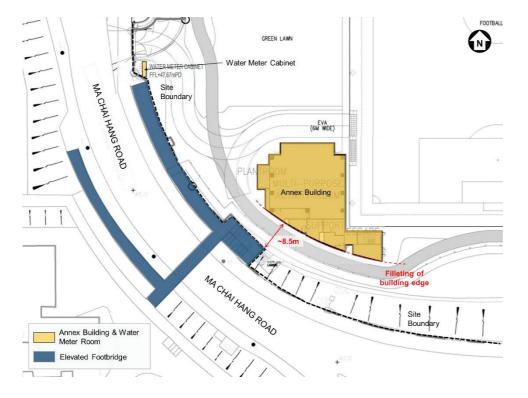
Layout Plan of Annex Building & Water Meter Cabinet at Ground Floor Level under <u>Proposed S16A Application Scheme</u>
